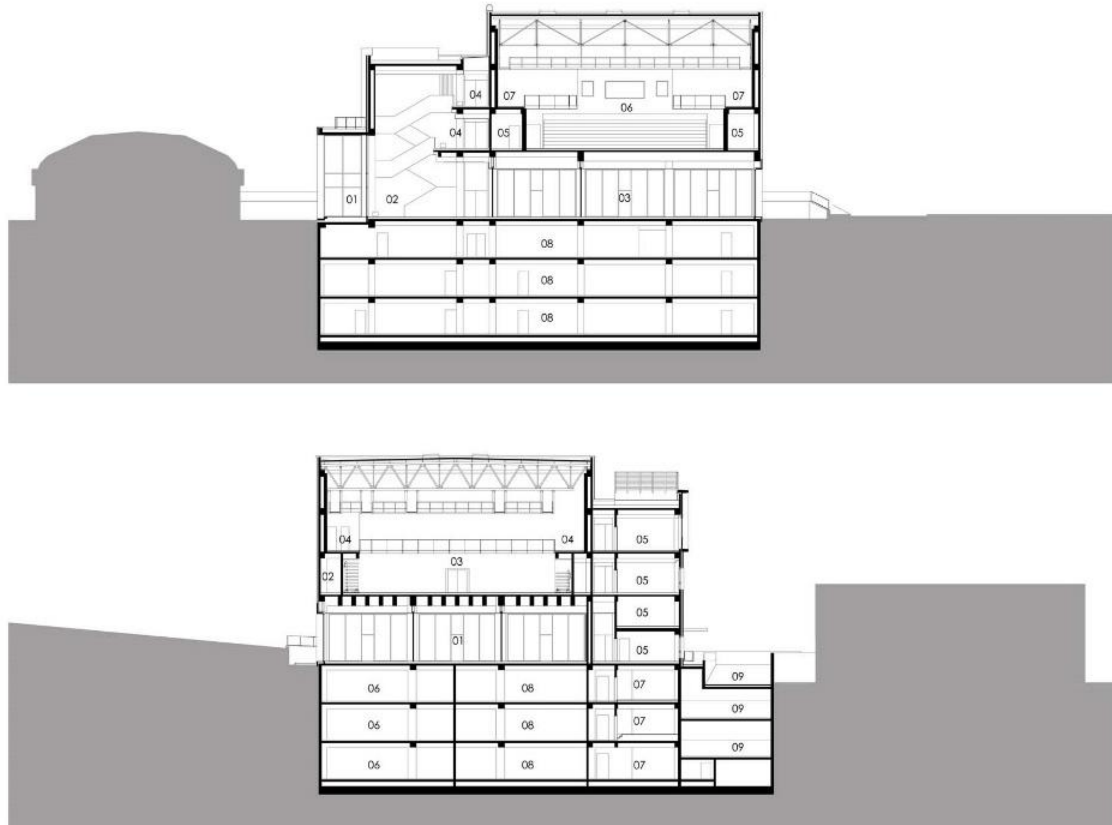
Sections of Alan Kadıköy Building (Arkitera Architecture Center, n.d.).
